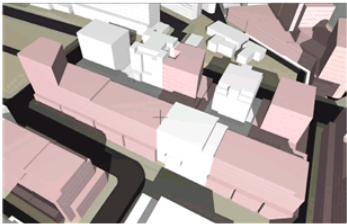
AREA C - BUILDING ARTICULATION AND SETBACKS
